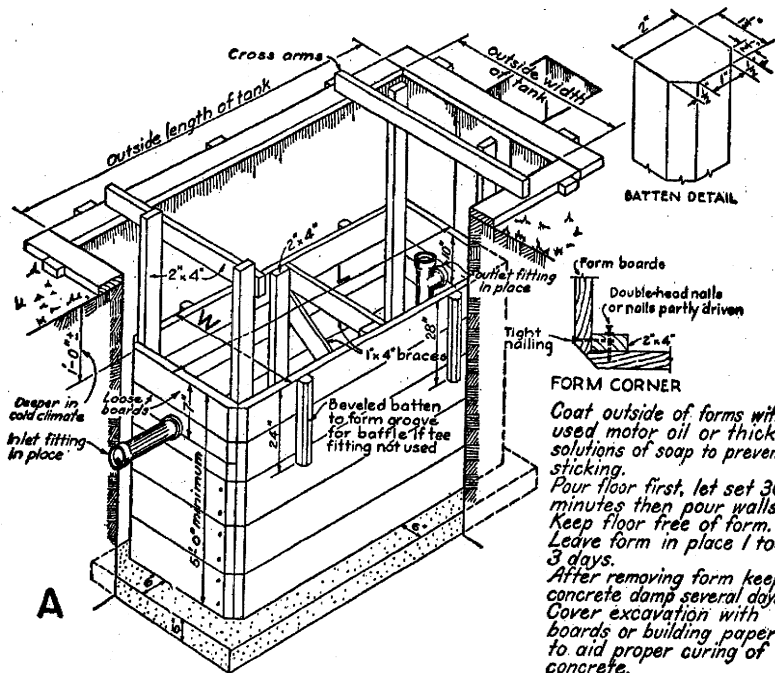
, A, shows how the inside form is built and hung in place. It is important that it be true to dimension and that the supporting cross arms hold it in correct position so that walls and floor are of proper thickness and the inlet and outlet fittings are true to line and grade. The drawing illustrates a method of placing the inlet and outlet fittings by carefully setting and tying before the concrete is poured. An alternate method is to form a notch or opening in the tank wall and later set the fittings to position with mortar or grout—after the concrete has hardened. If tee fittings are used it is advisable to prejoin the first length of pipe to the tee and set the two as a unit.
